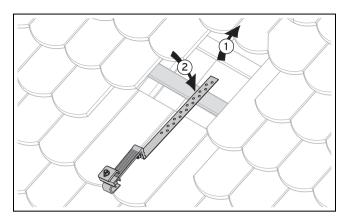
Remove slates and fit the type S flat roof bracket (shown here: on the roof batten)
